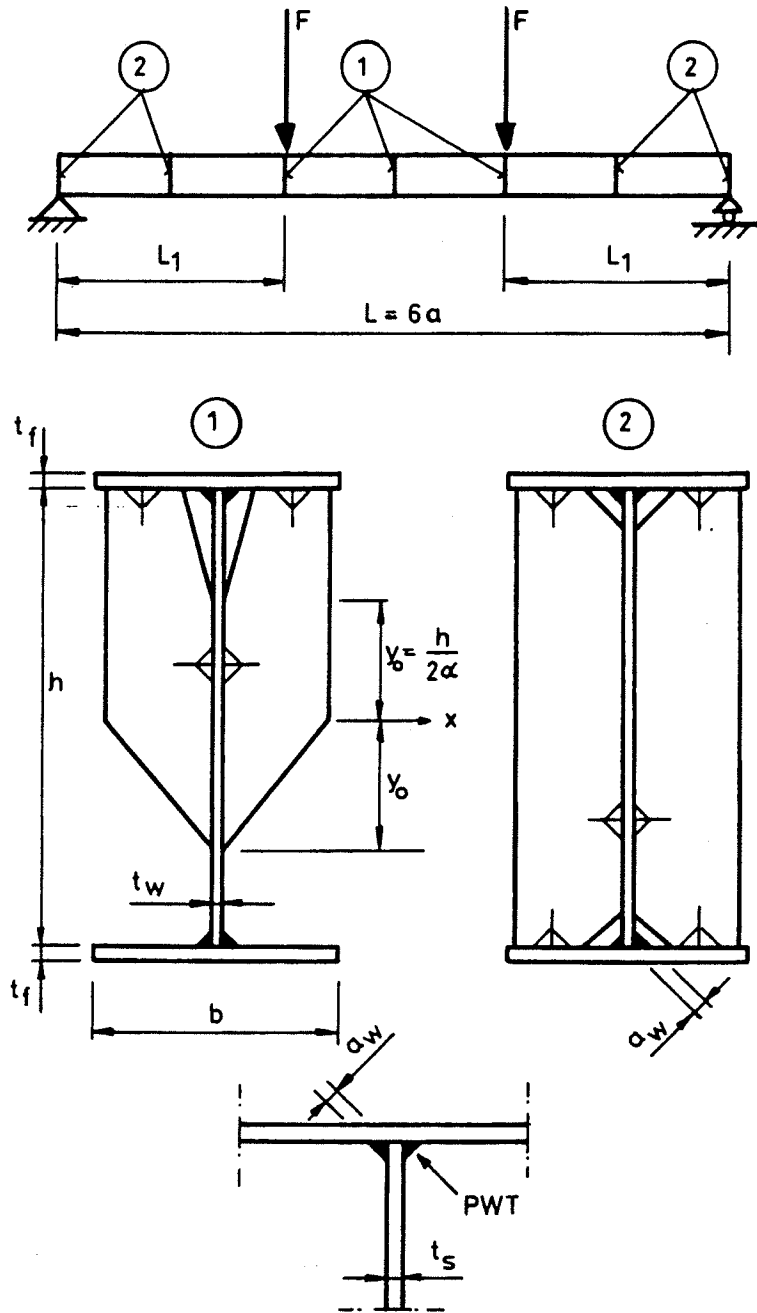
Welded I-beam with vertical stiffeners. Double fillet welds with (1) and without (2)
